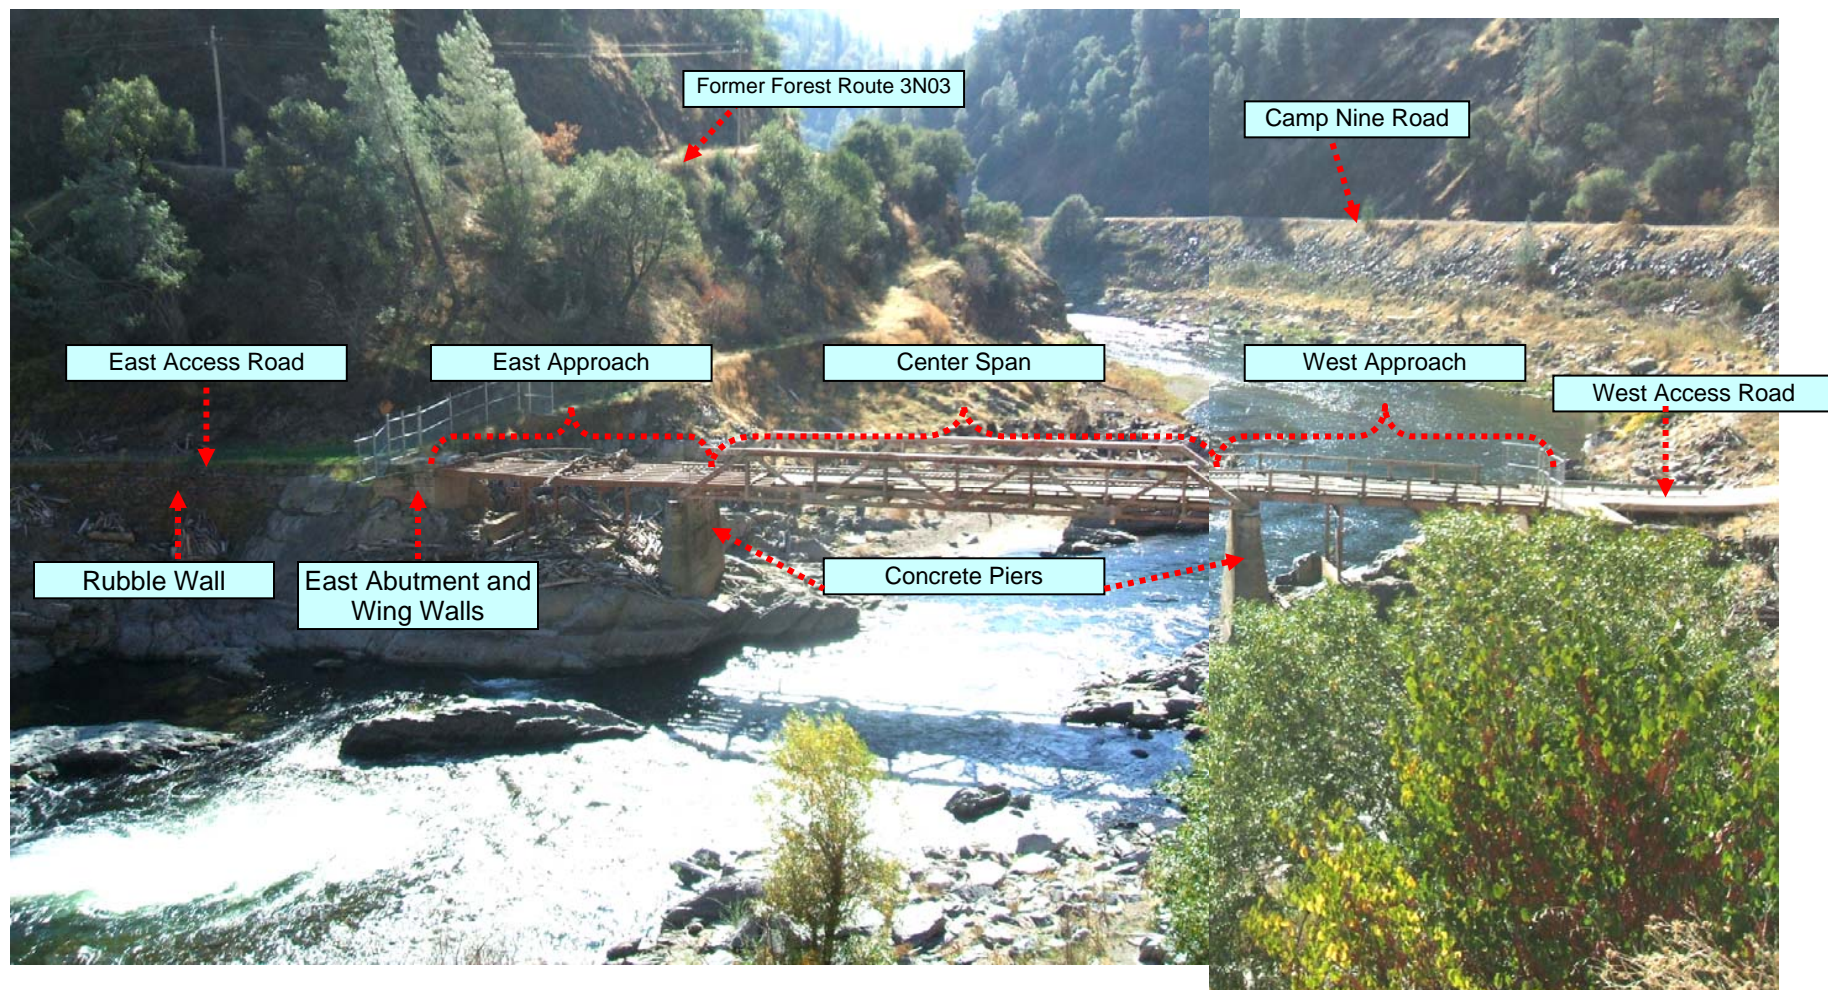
Bridge Component Overview (Looking South / Downstream)
